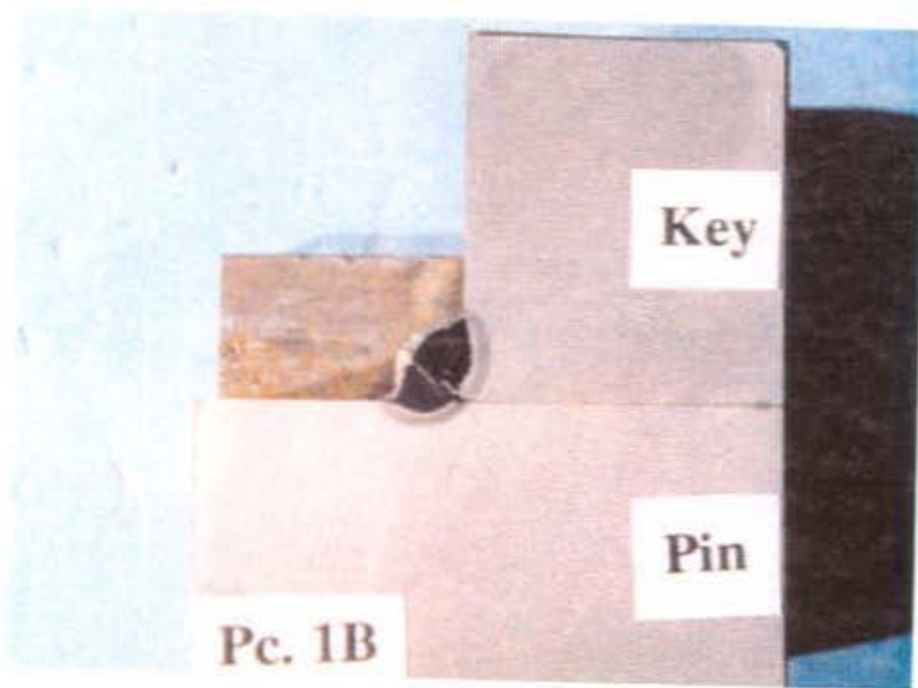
Cracked retainer weld at Keyway 1B. (ATLSS)
